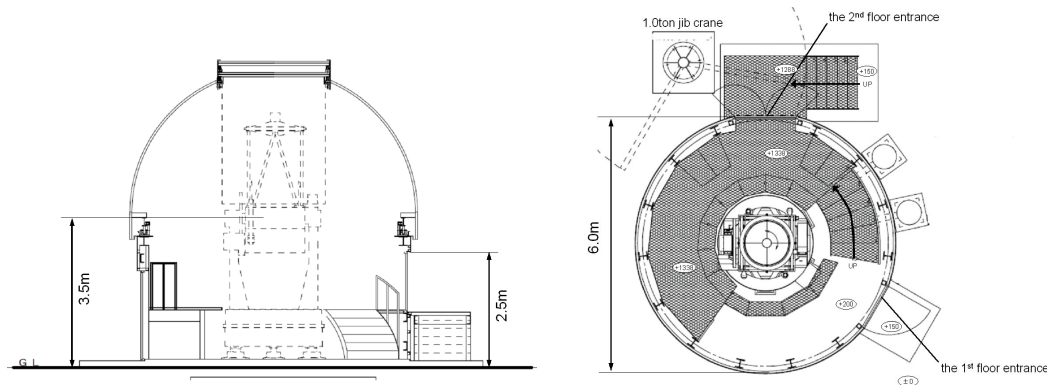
Schematics of the 6-m dome. (left) Cross-sectional elevation view from the first floor entrance. (right) Cross-sectional plane view. Up side is north. The 6m dome and the summit facilities are constructed by Kokusai Kogyo Co. Ltd and Nishimura Co. , Ltd.
